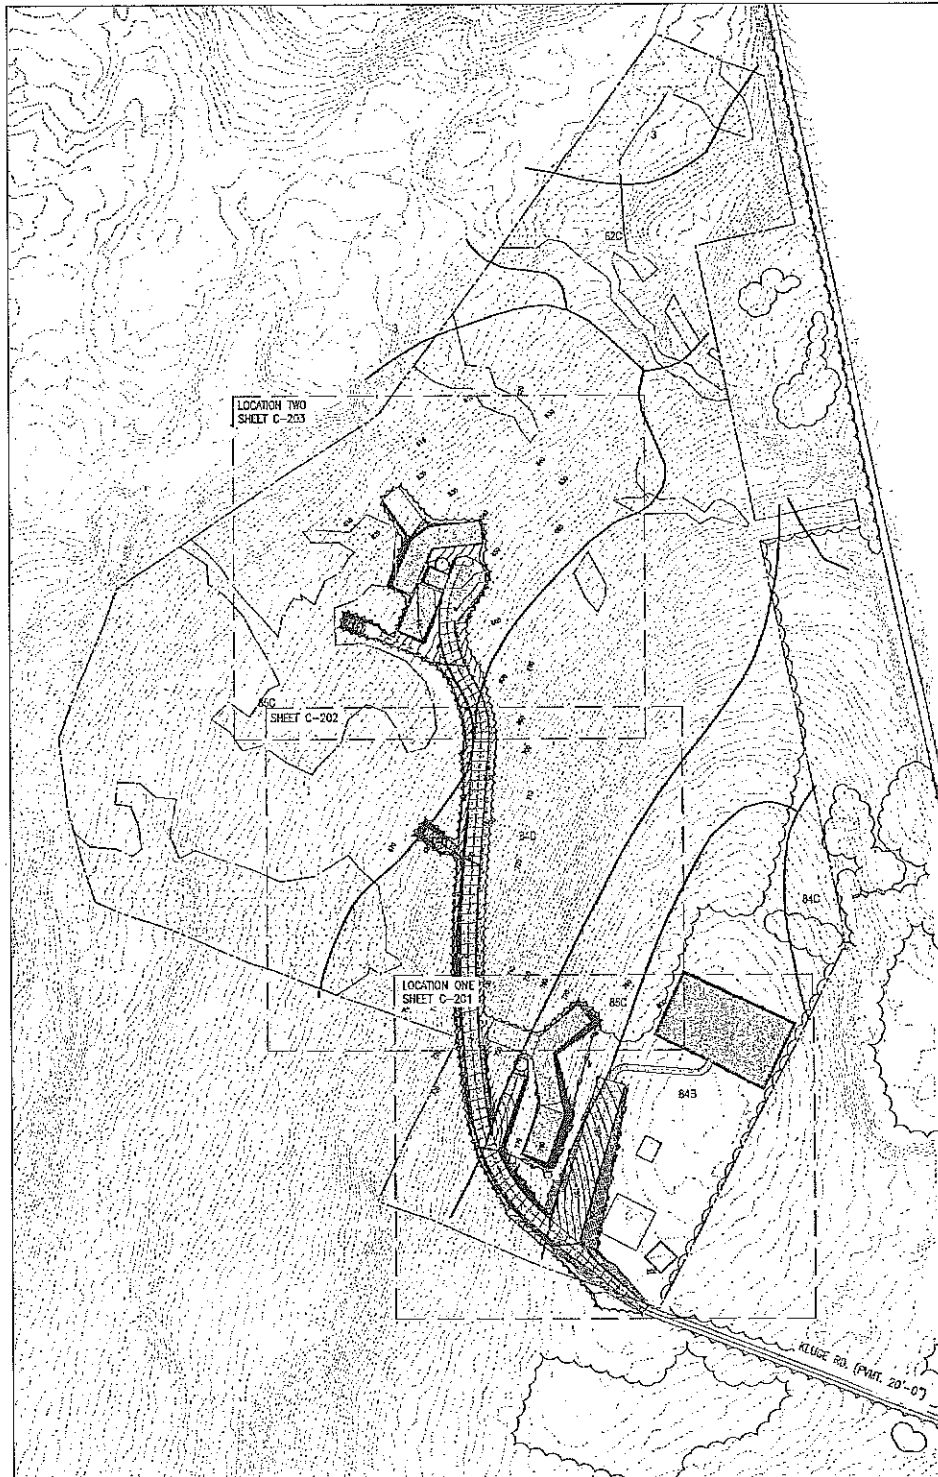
Original Site Plan – showing turbine locations, blade laydown areas and clearing limits. (BNE 1, Vol. 2, Tab F)
